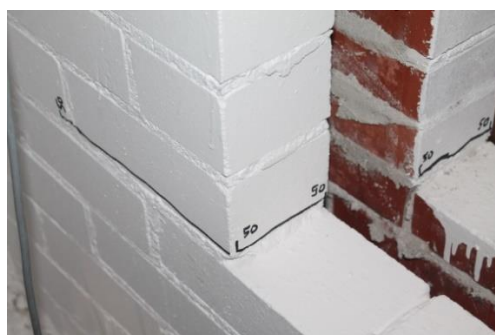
EQ-NPR 50% pier base cracks: C9 on the inner leaf and corresponding crack on the outer leaf.
